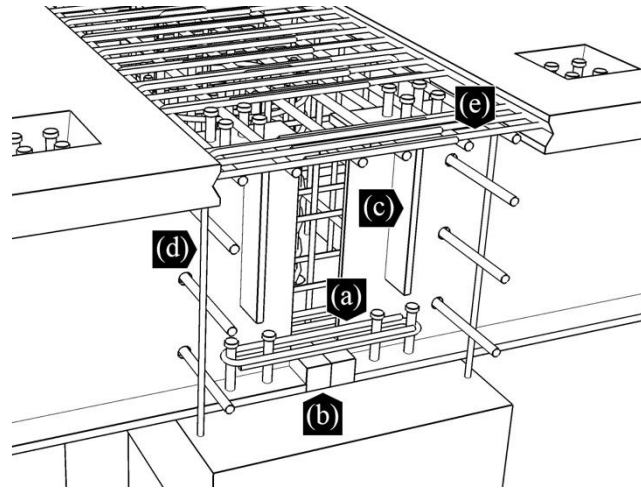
Details of the SDCL connection: (a) tie bar, (b) steel block, (c) stiffener, (d) cap beam stirrups (dowel bars), (e) deck longitudinal bars
